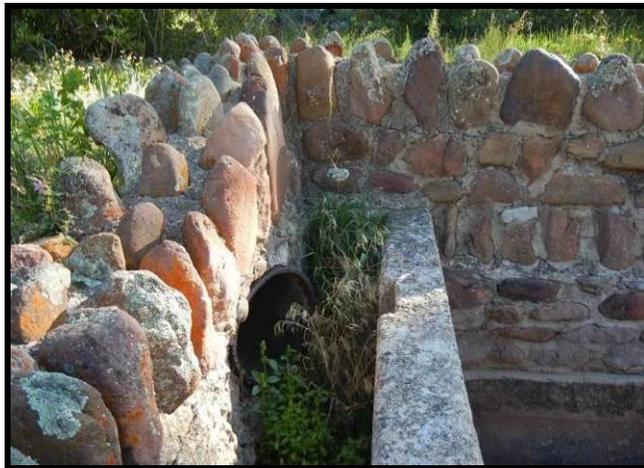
North elevation wall, showing the outlet pipe and the water supply channel for the raceways. View to the east.
